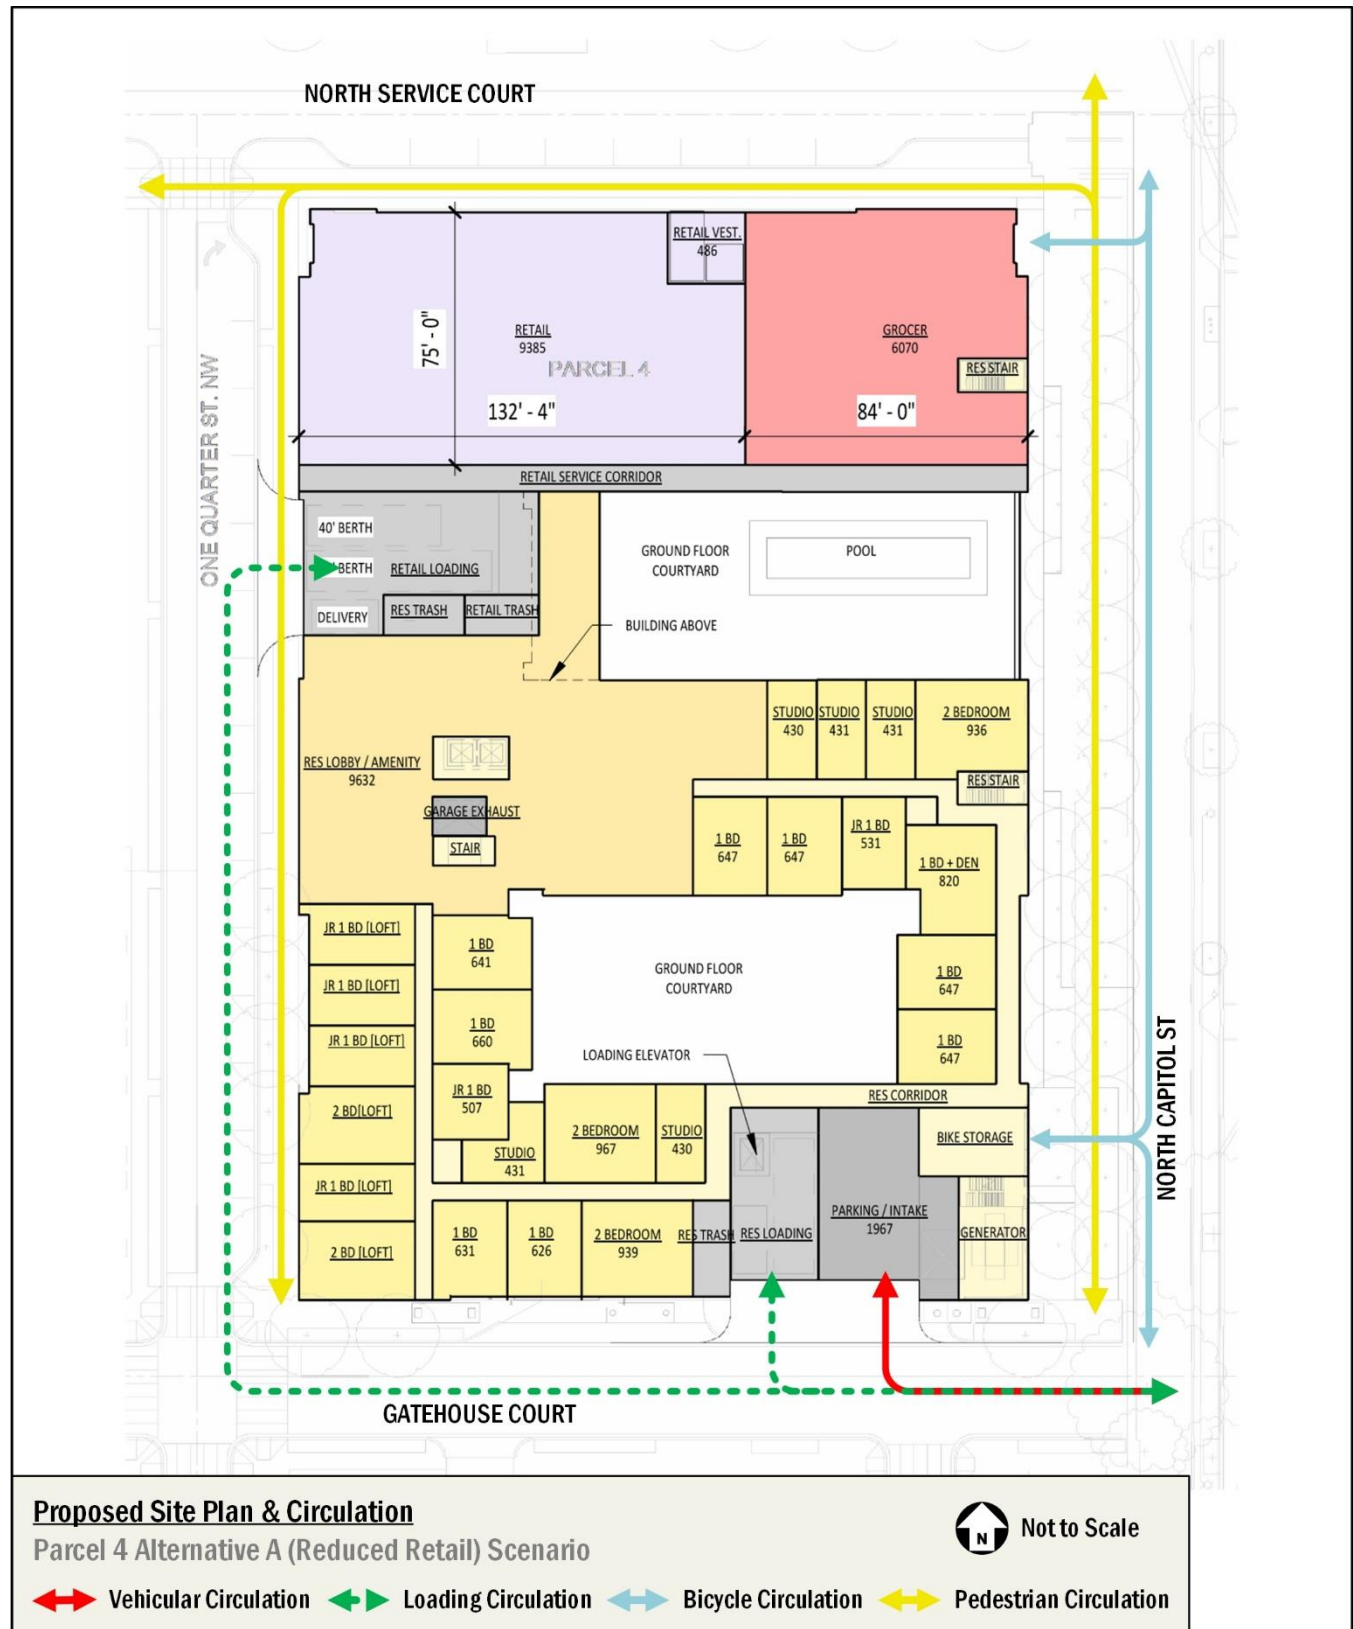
Proposed Site Plan & Circulation – Parcel 4 Alternative A Scenario
